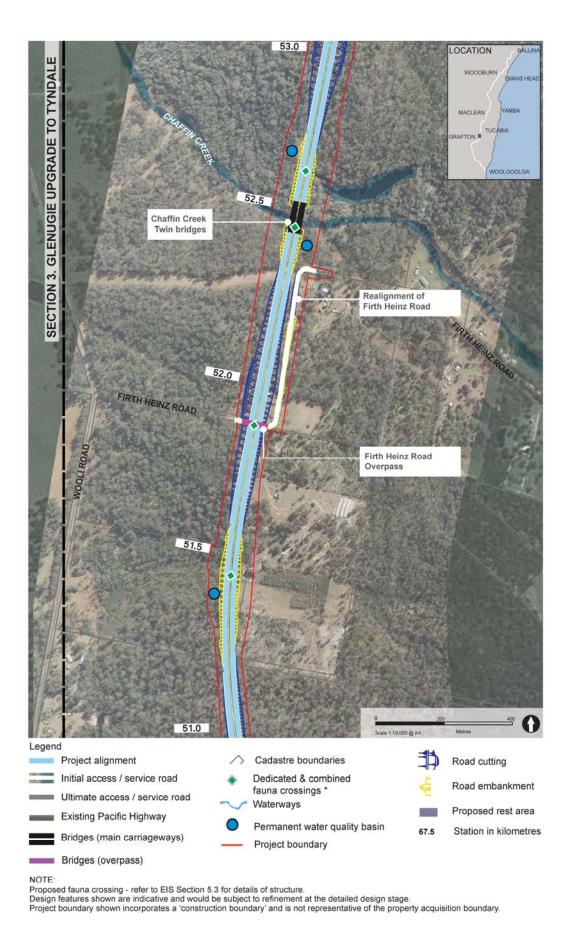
The project - Section 3 (Station 51.0 to 53.0)
